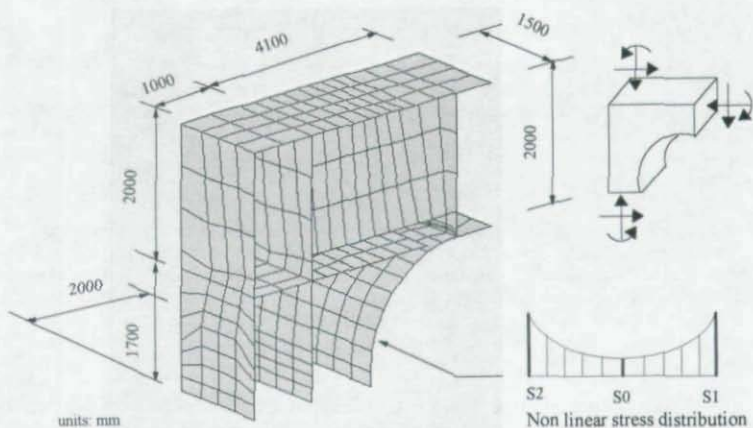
Section view of the 3-D finite element model of the inner-stiffened box-section corner of L-shaped frame
